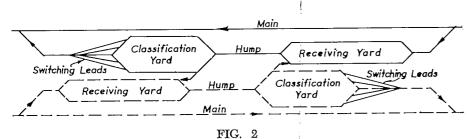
shows in solid lines the receiving and hump classification yards located end to end for handling one direction of traffic. Trains depart from the classification yard. A similar arrangement, shown in dash lines, can be provided for traffic in the opposite direction.
